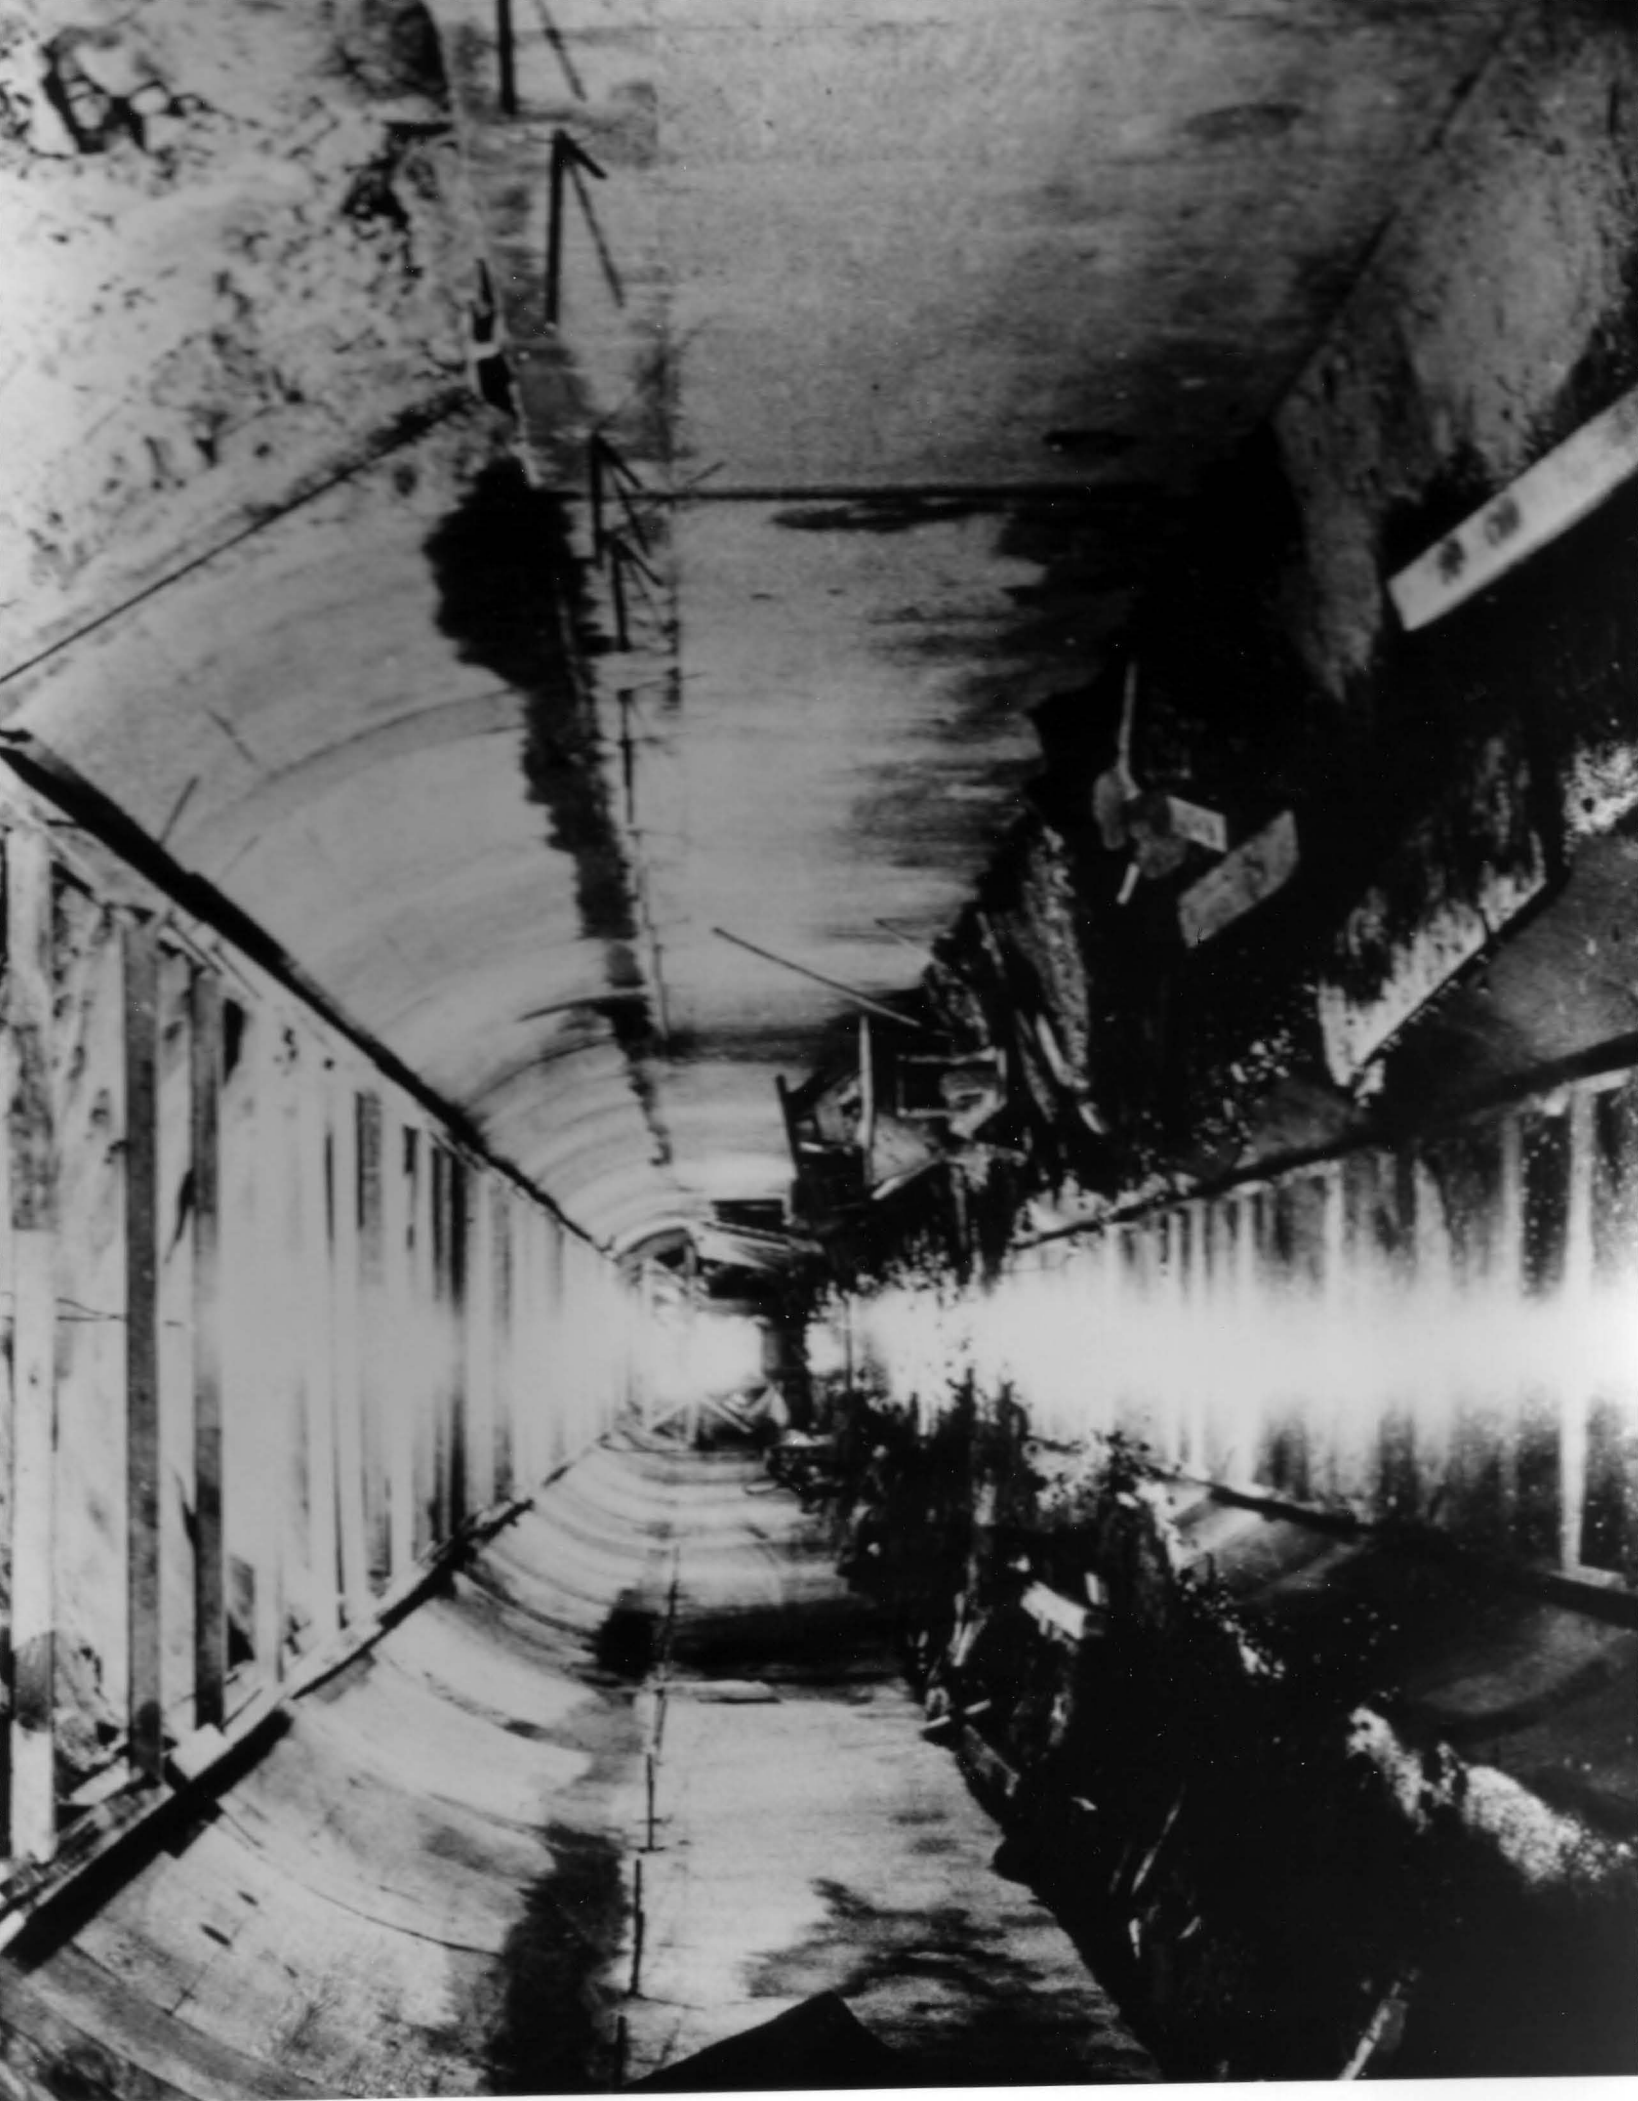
INTERIOR OF TUNNEL LOOKING SOUTH. CONCRETED LINING COMPLETED ON INVERT AND WALLS, ARCH PARTIALLY COMPLETED. 11 March 1944.
